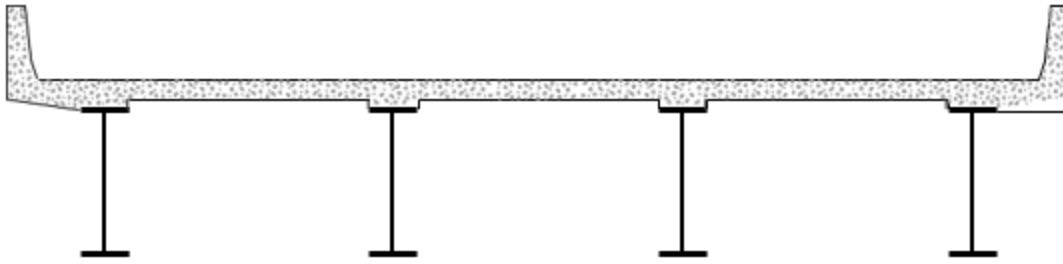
Typical composite rolled I-beam or welded I-girder bridge cross-section.
